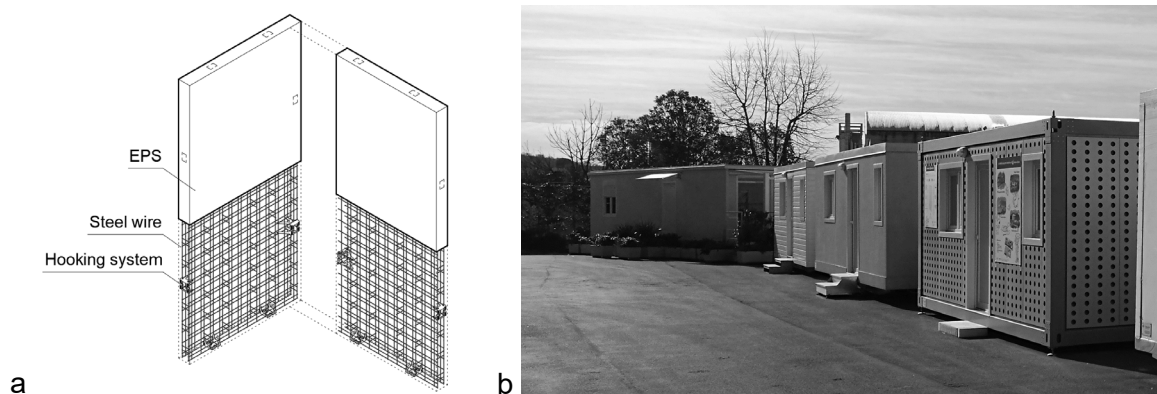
a) Reinforced-EPS panels and assembly; b) Prefabricated units with different dimensions and external finishing systems.
